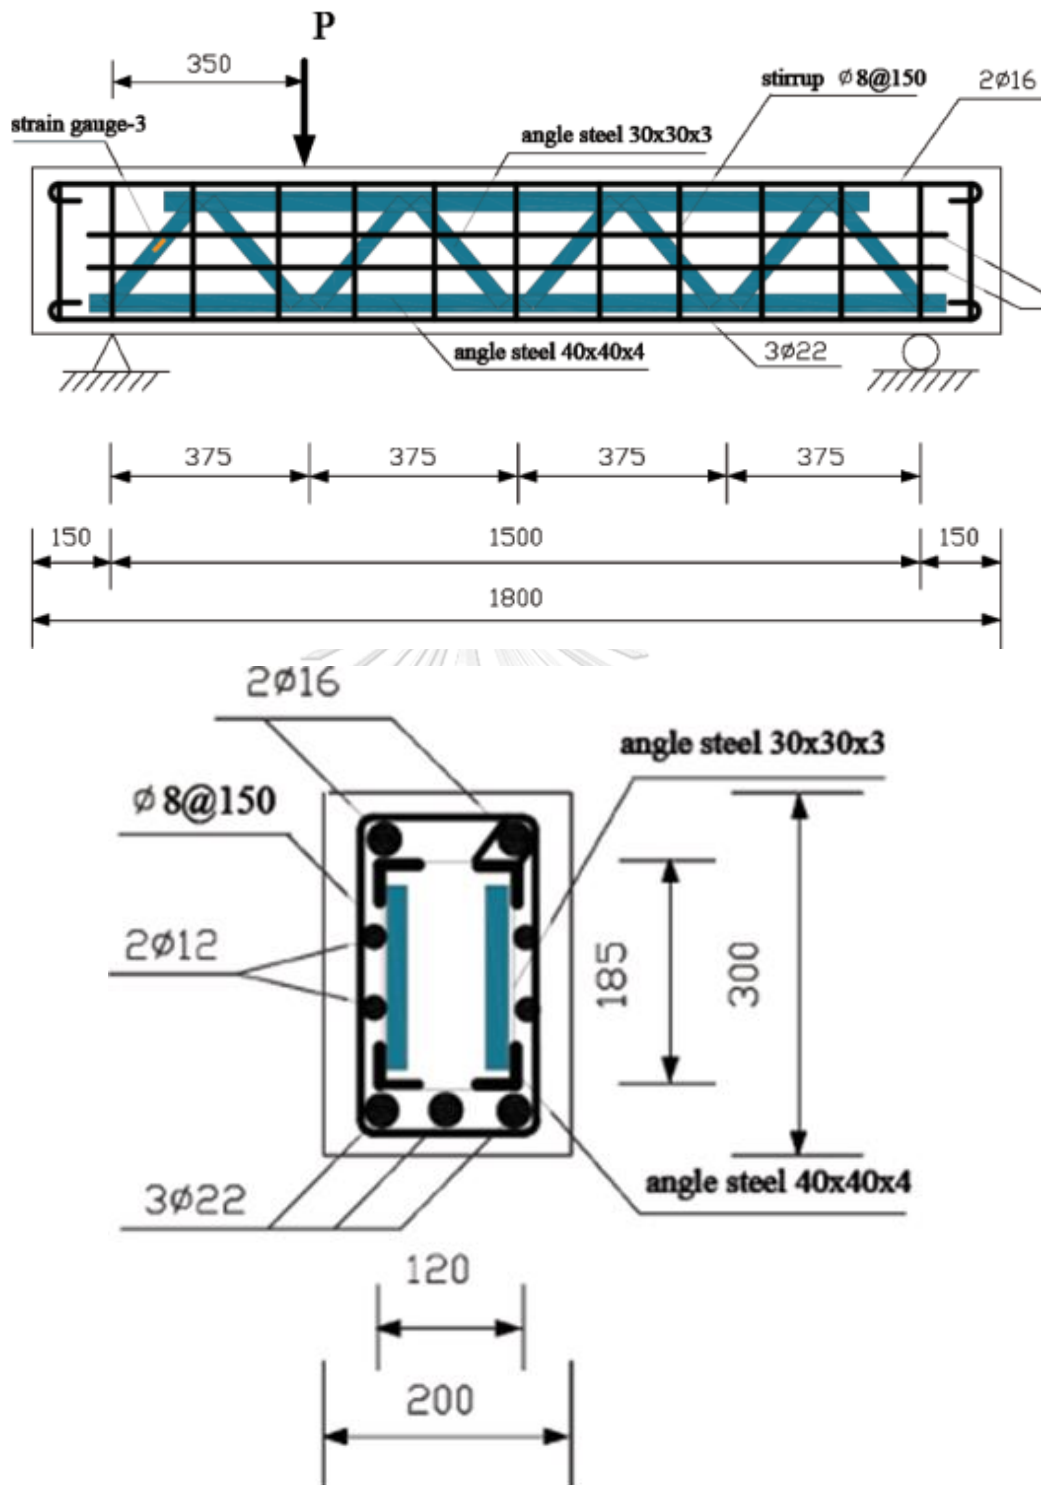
Profile and cross-section detail of SRCB5 (Zhang et al., 2016)
